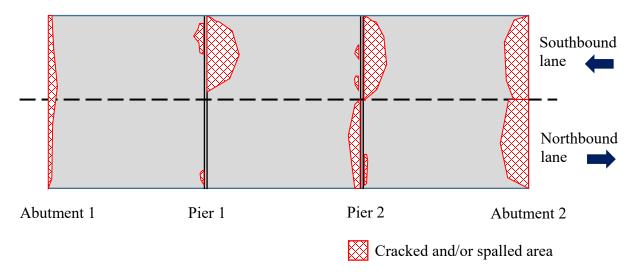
Damaged Areas on 023B00040N Bridge Deck
